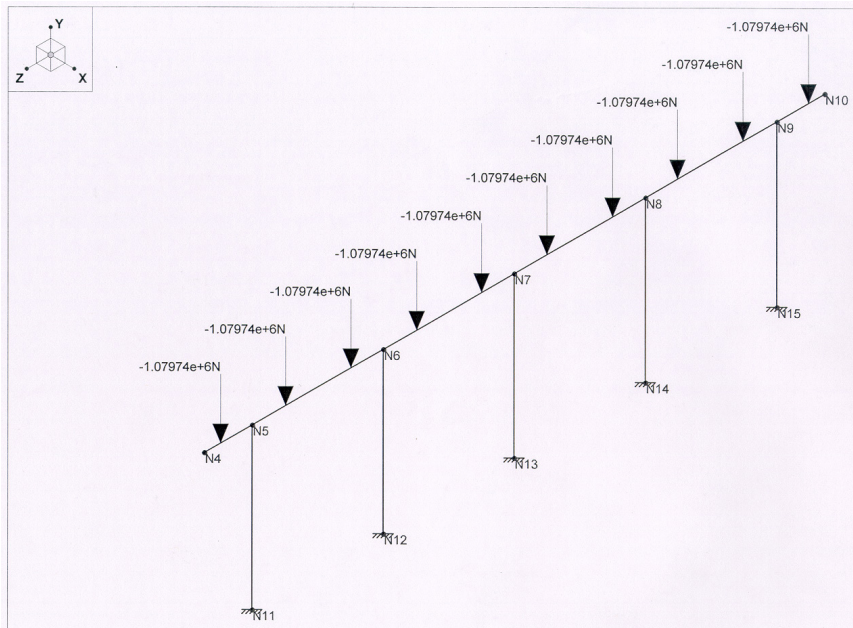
The loading on the pier performed to determine more accurate dead load effects on the pier cap beam and columns.
